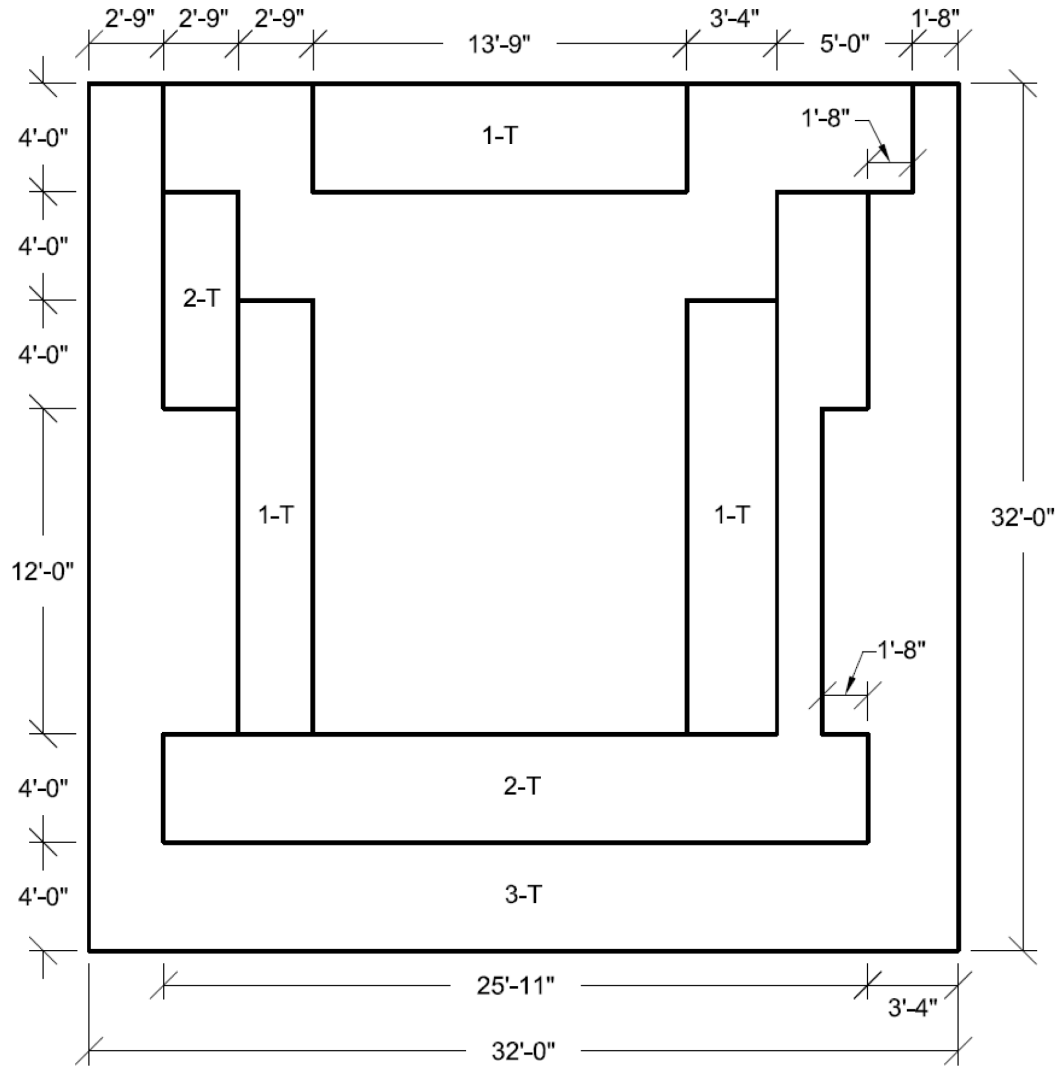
H.6-189 DGFOSV Wall 12 Looking From Outside Transverse Reinforcement Zones
